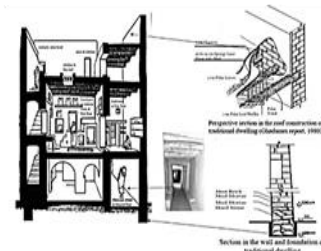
Cross-section of a typical dwelling and Construction Techniques [33].
